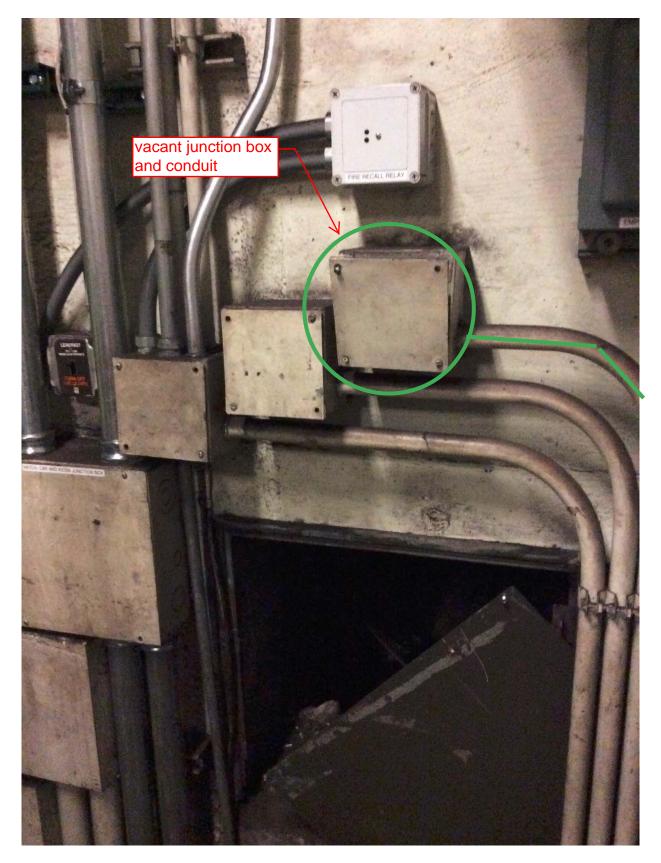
A05 Cleveland Park: Elevator Machine Room #200, proposed conduit run between open trench and Battery Room #218
